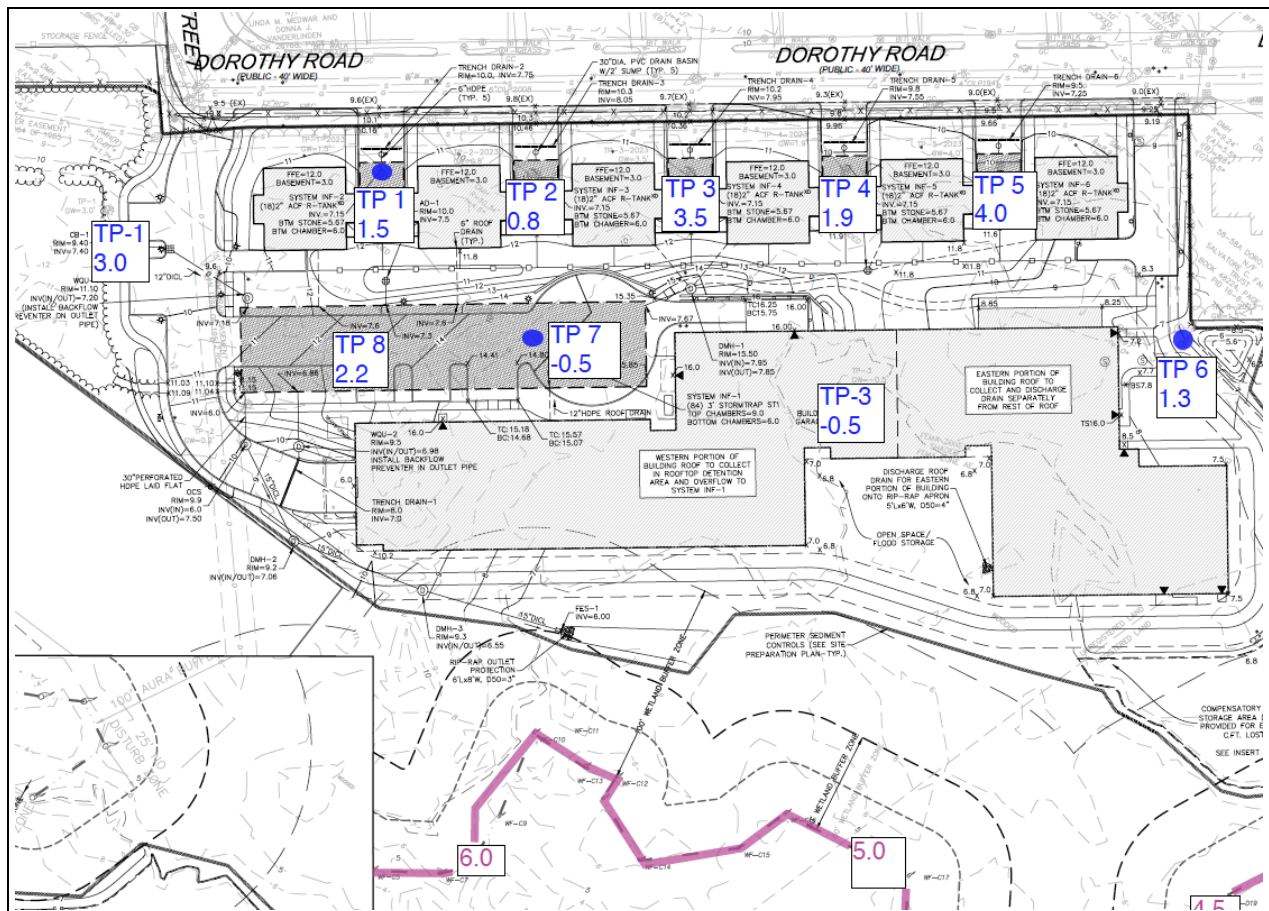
Site Plan Hydrology (Groundwater Levels -Blue, Wetlands Elevations - Green)
